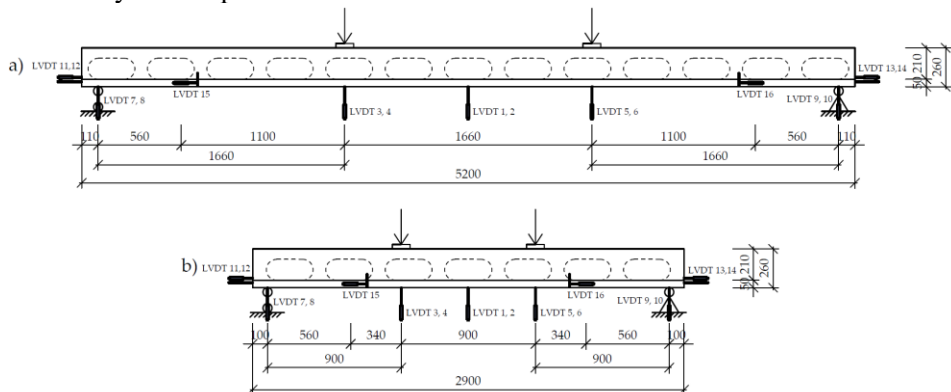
Layered slab testing arrangements: a) slab S-1; and b) slab S-2
